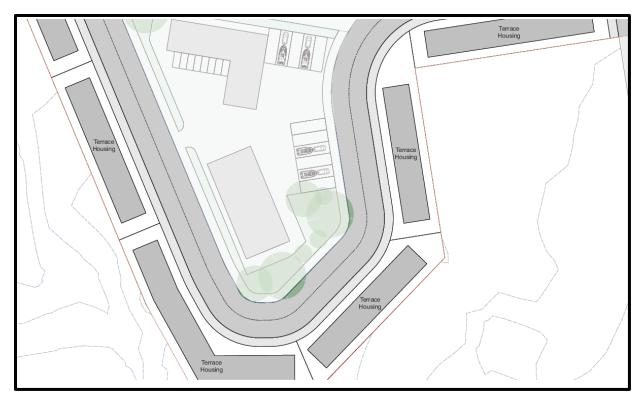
Part of Lot 7 of the Mixed–Use Precincts Site Plan (Source: Robert Harwood Architects)
